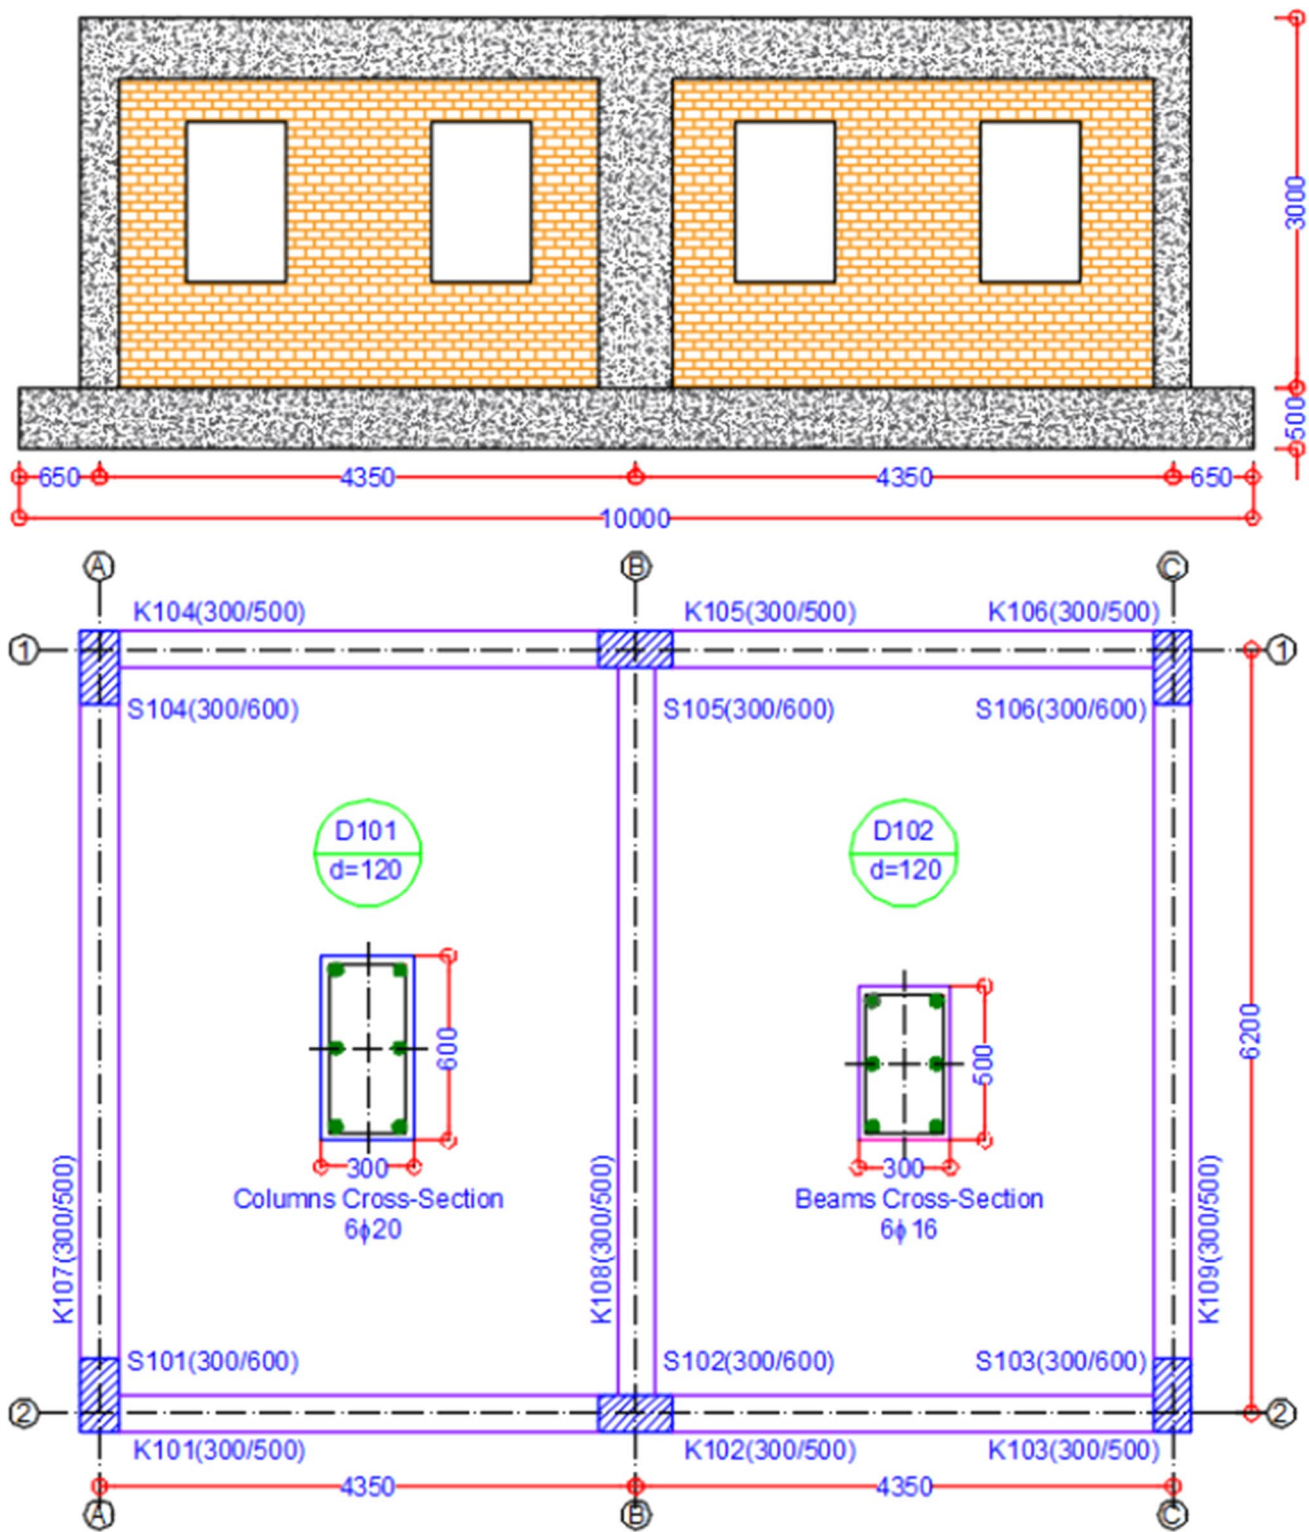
The 2D views of the RC buildings and the cross sections of the structural elements (all dimensions are in mm)
